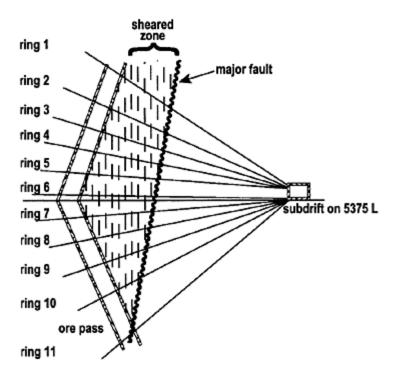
Layout for reinforcement rings for sheared zone, after Singh (1973).
